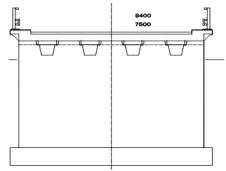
Cross section - Strengthened superstructure RC/Steel composite Report from previous bridge 34 Inspection
